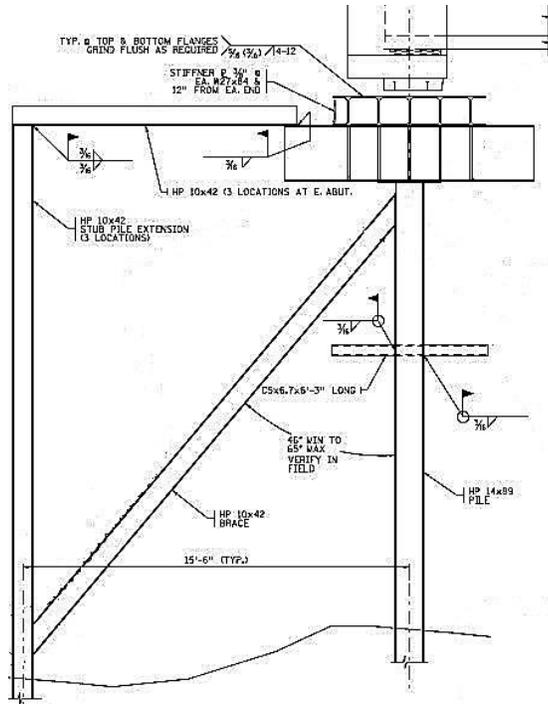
End view of the Larpenteur Ave temporary abutment substructure
